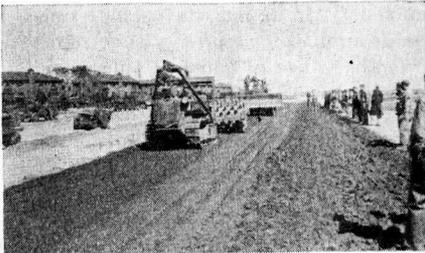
Each step of construction is demonstrated by use of construction equipment supplied to engineer units.
